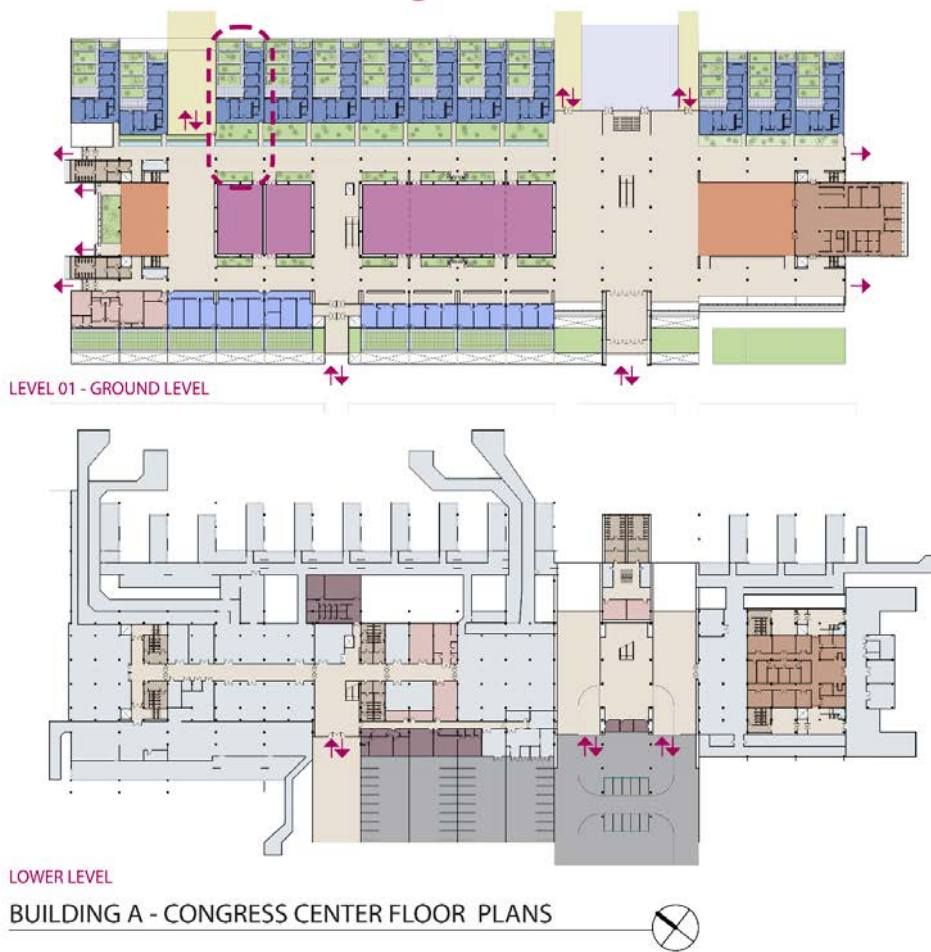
Detailed lower and ground level floor plans of Sava Center’s *Building A* – Main Administrative Building and Congress Center (personal archive).
